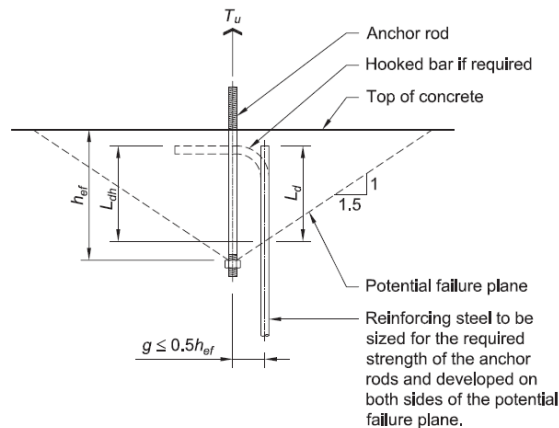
The use of steel reinforcement for restraining tension concrete breakout.
